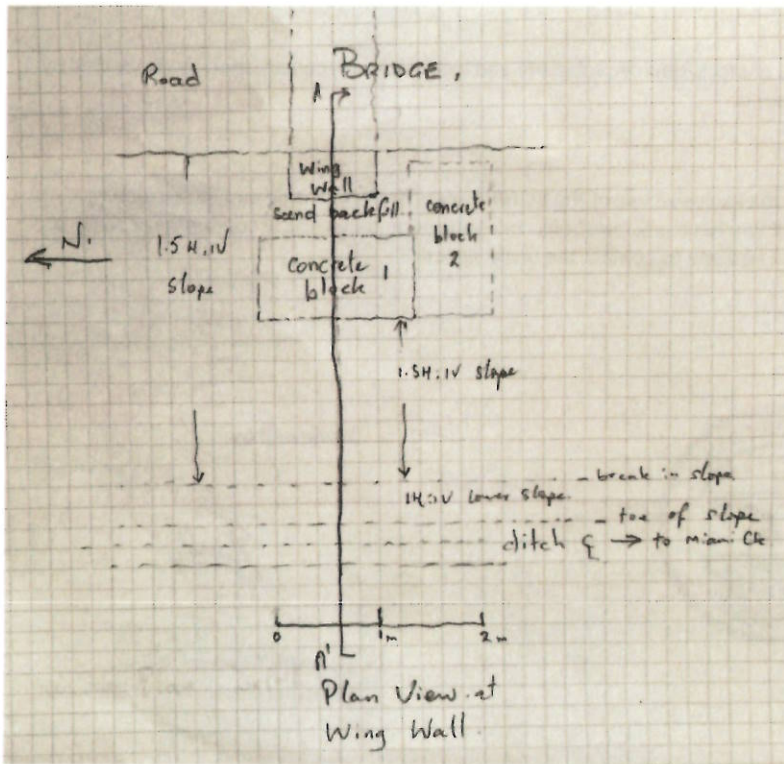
Conceptual Plan Sketch of the Wing Wall and Embankment with Mid Slope Butress
